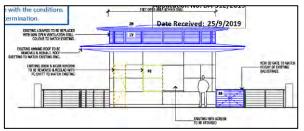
Proposed modifications to promenade level of Lifeguard Tower and Tunnel 2 (demonstrated in blue).
